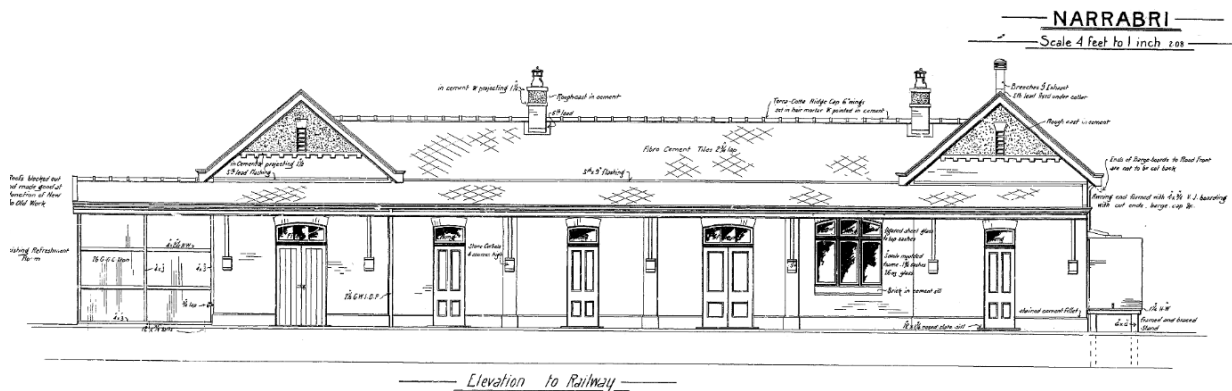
Narrabri Railway Station, n.d. (Source: NSW Plan Room No D53/110)
